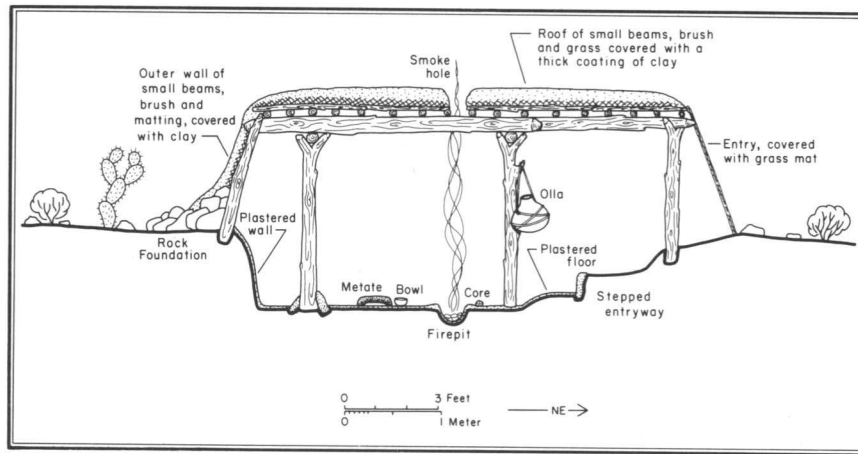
Reconstruction of excavated pit house (Feature 1987-1), Linda Vista Hill.
